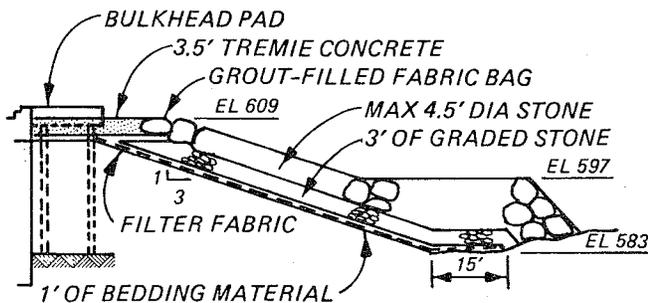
Scour protection plan for Pike Island Dam, Ohio River
